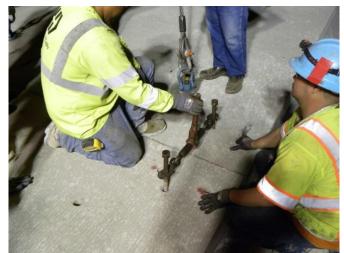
Photo. Turnbuckle use to ensure a tight fit between panels.
